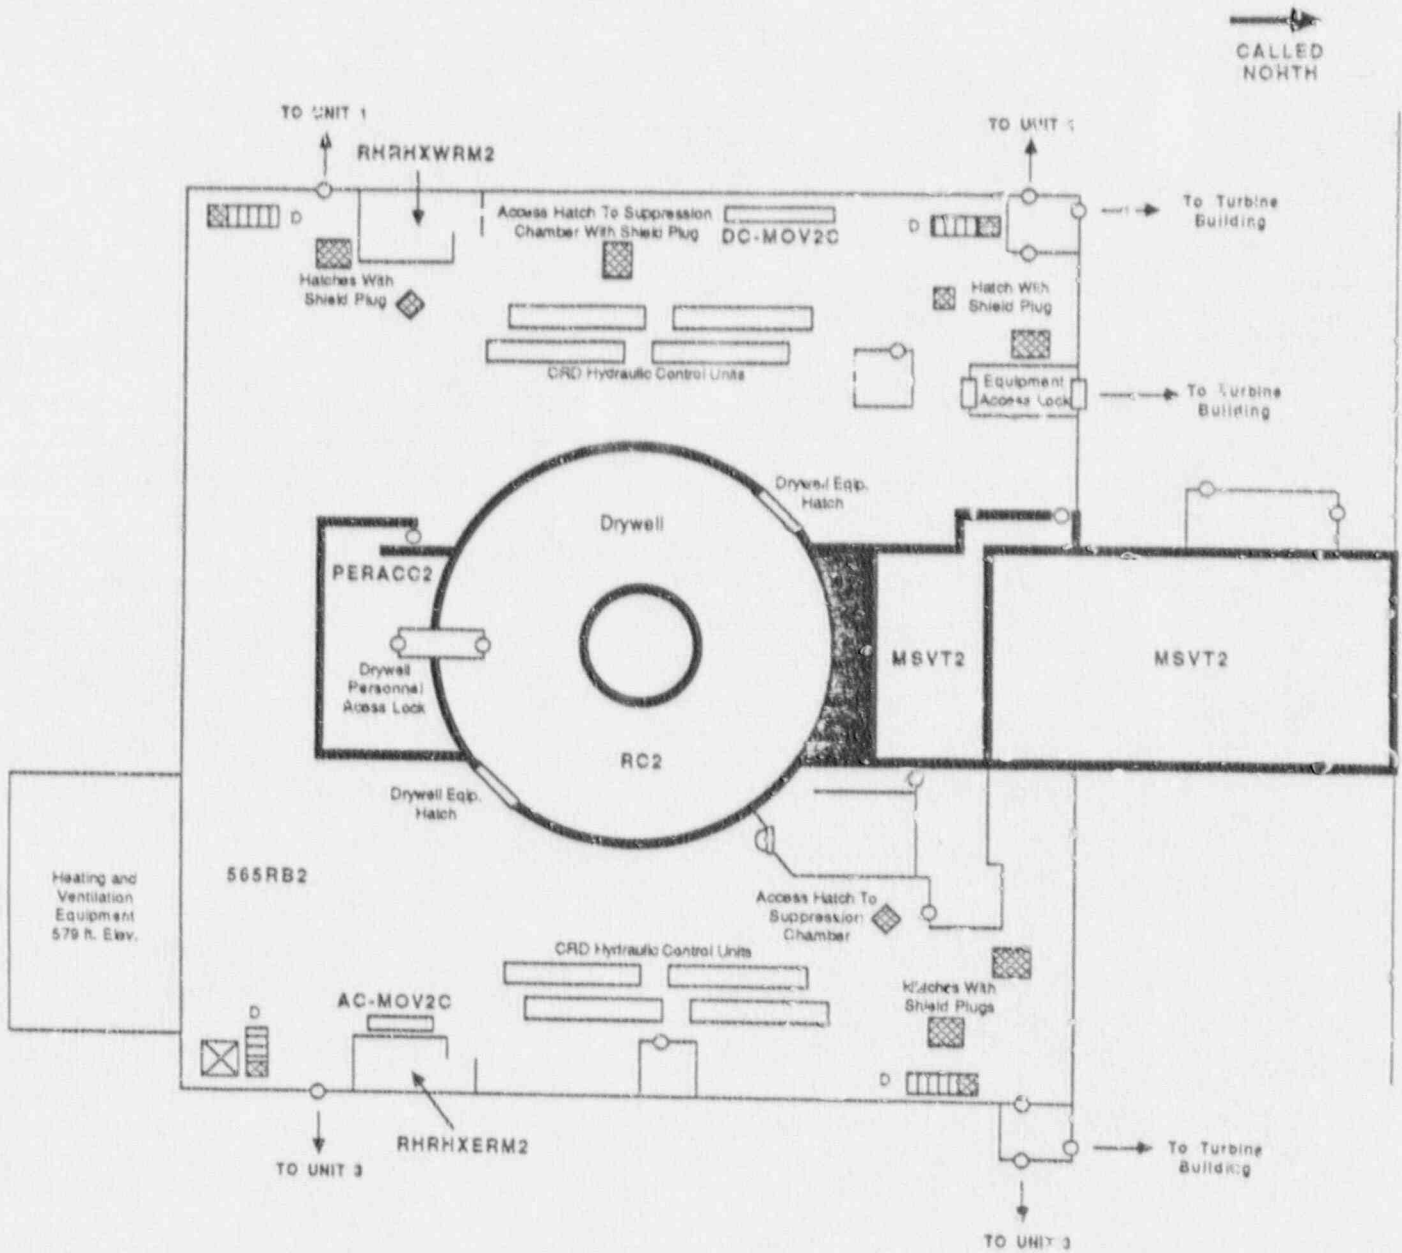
Browns Ferry Unit 2 Reactor Building - 565 ft. Elevation.
